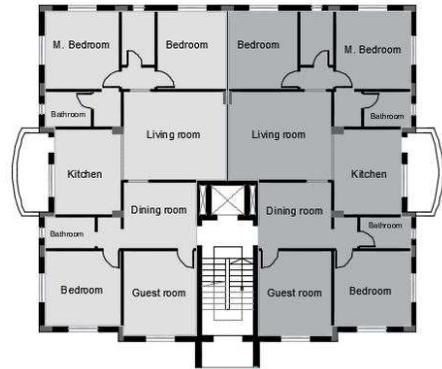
Multi-story residential building plan: each floor consists of two apartments – source : researcher
